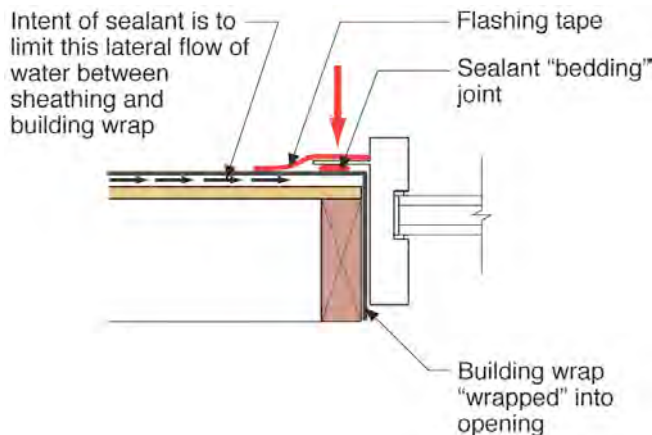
Control of Water at Window Jamb - A heavy bead of sealant is installed behind the flange of a window and it acts like a “gasket” smushing the building wrap against the sheathing limiting the water that can run sideways into the opening. The “red arrow” shows the “smush” direction created by screwing the window flange into the sheathing and frame opening.
